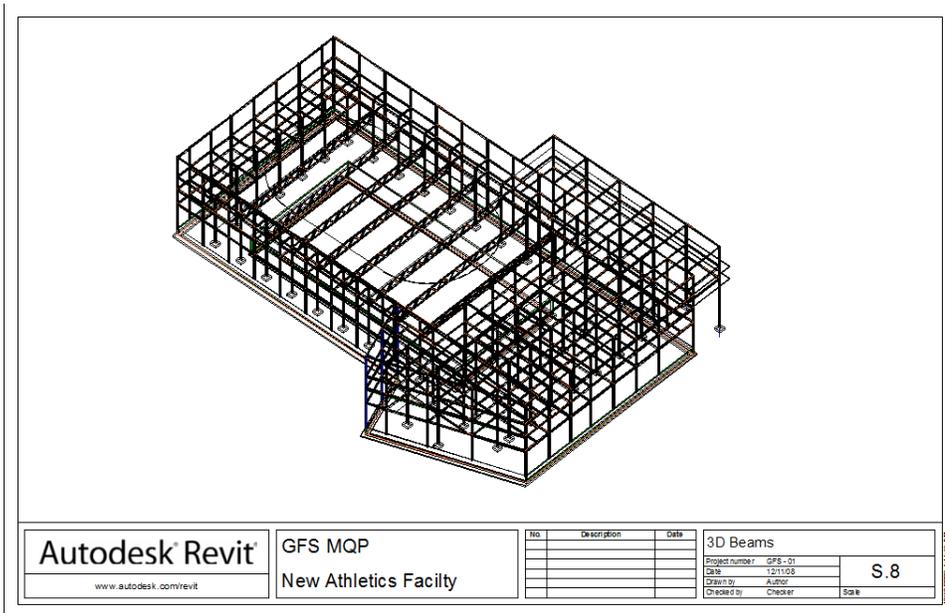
MQP Revit Model, Structural Beams 12/11/08
